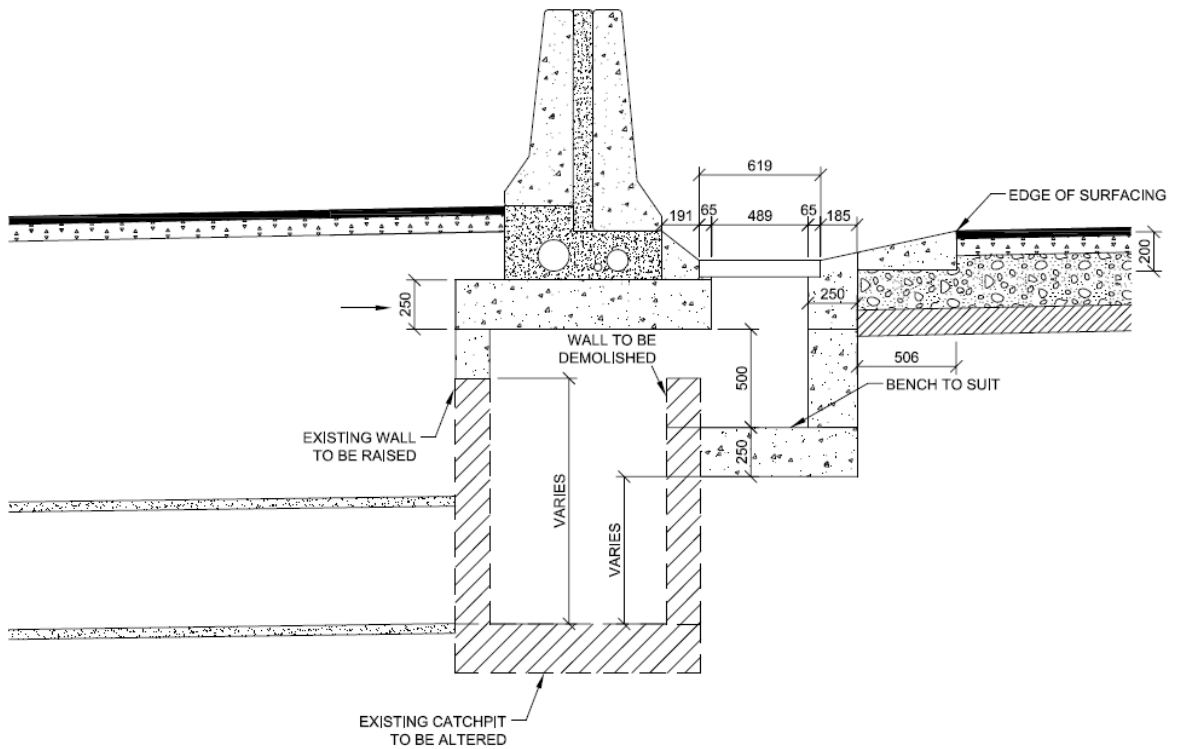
shows a plan view of a standard median catchpit. Catchpits collect runoff from the median drains, which is channelled to a 600mm diameter drainage pipe that drains to the verge. Figure 3-6 shows a cross section of the median catchpits. The catchpits have an F-shaped profile as a result of the road upgrading process, where existing median catchpits were retrofitted to the new road geometry.
